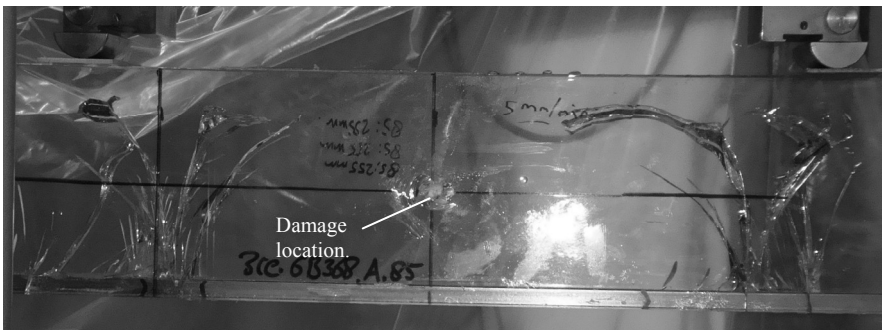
Initial failure in the side-impacted 3re.GB368.A specimen. Failure seems unrelated to the side damage.
